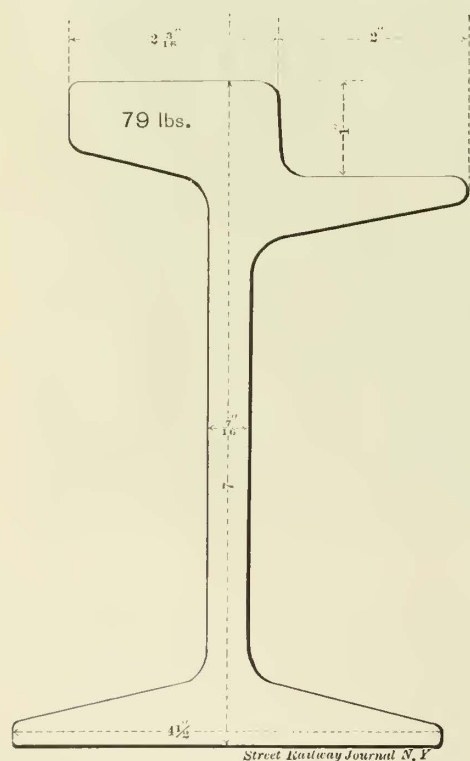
RAIL—MILWAUKEE STREET RAILWAY.
